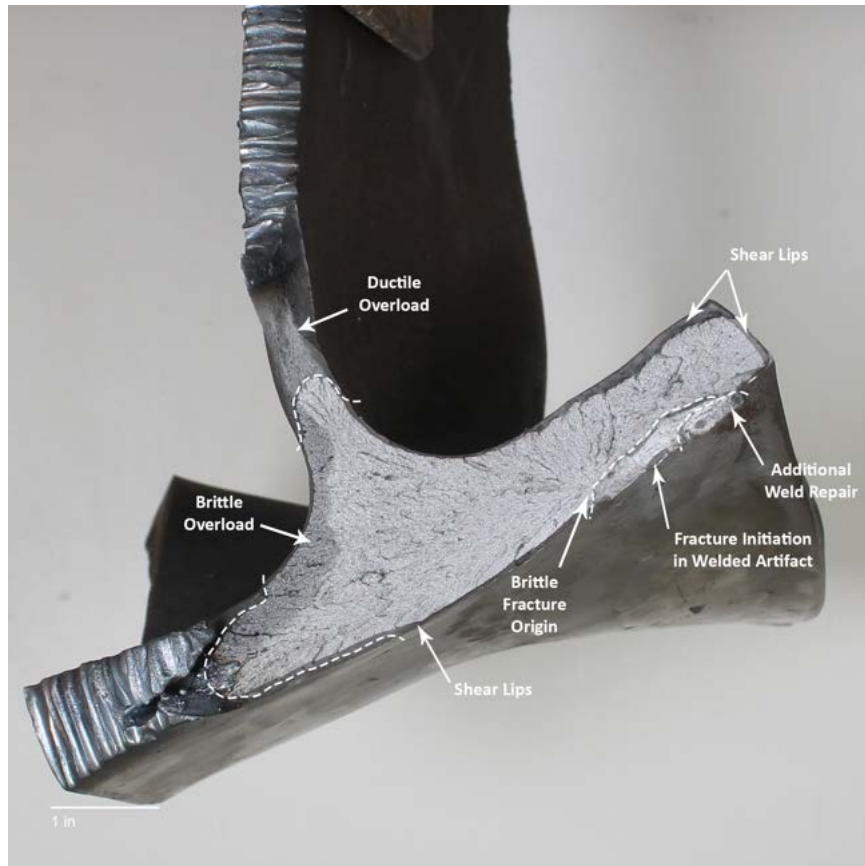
Bottom flange fracture farthest from the end-plate, looking towards the end-plate.
